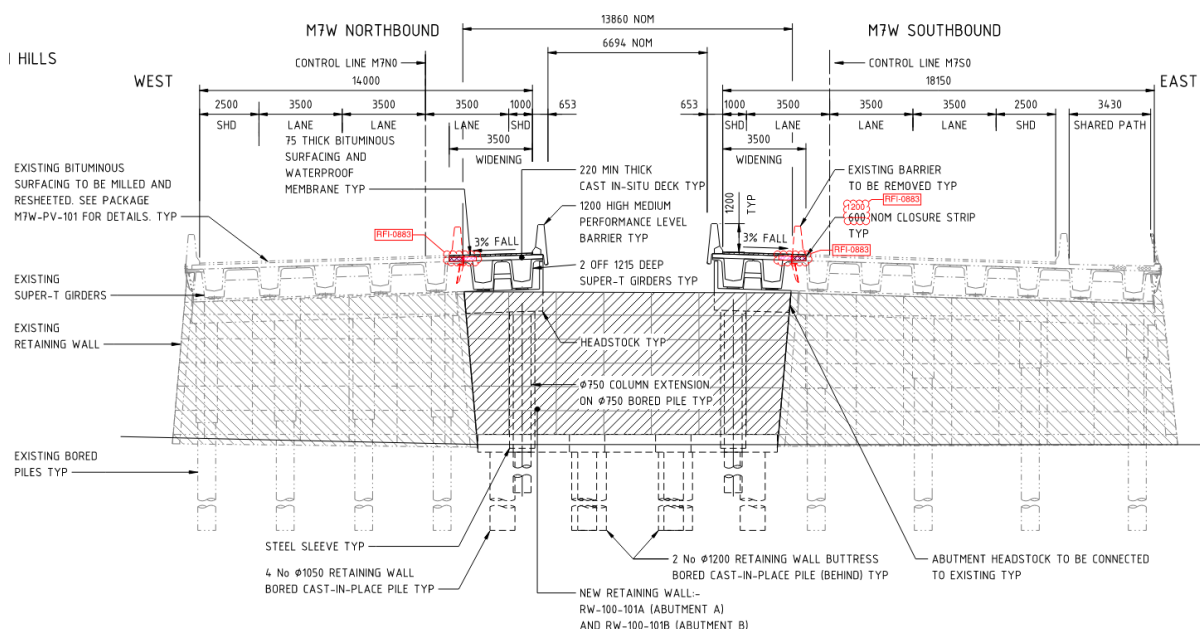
Abutment Front Elevation and Retaining Wall at Bridge Widening Infra 20.1/20.2
